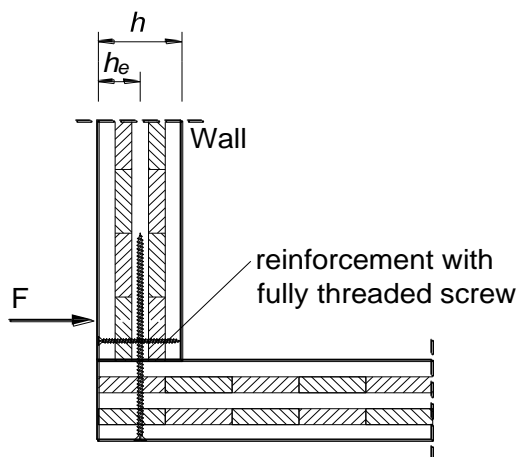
Reinforcement of a cross laminated timber wall with fully threaded screws
